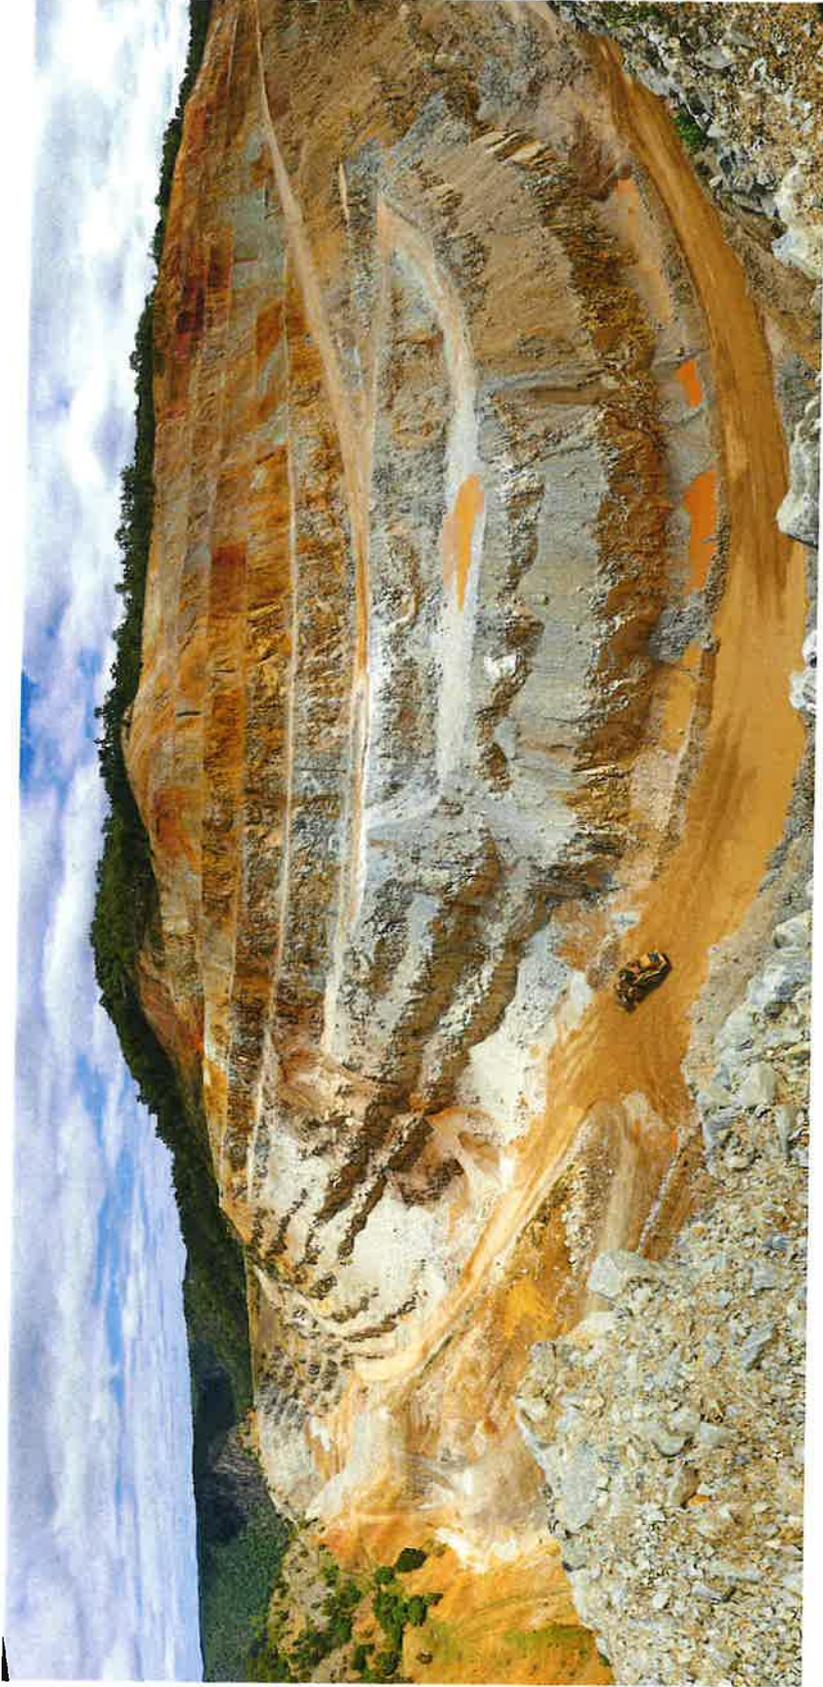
West wall in transition area between North and South pits and with cutback of upper slopes of west wall in progress.
